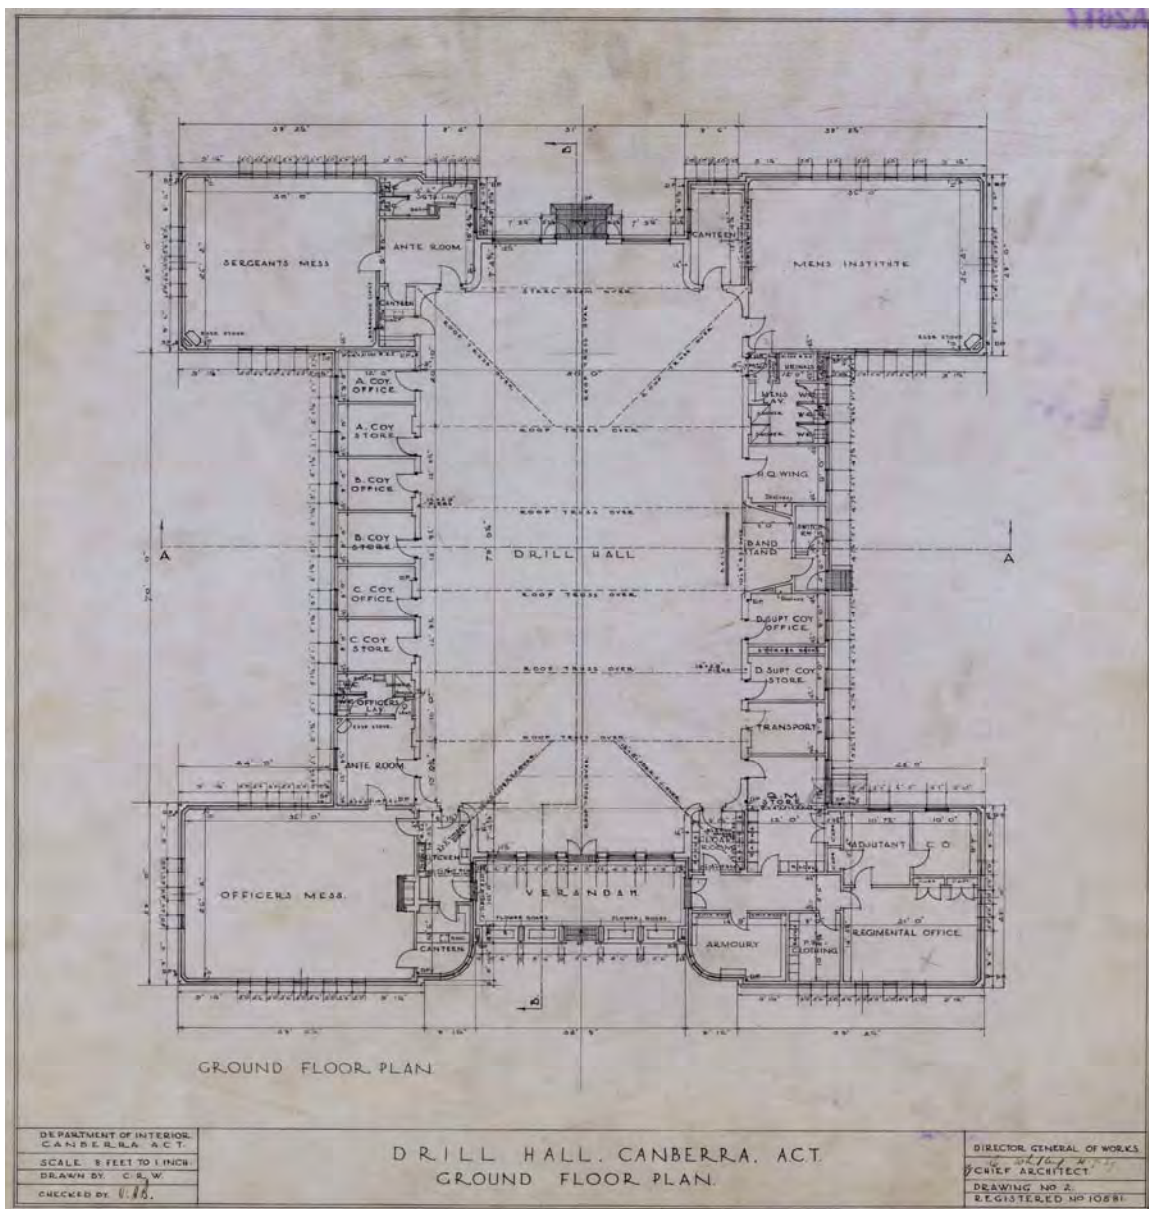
1939 Site Plan of Drill Hall Gallery (NAA: A2617, 2/10581)
